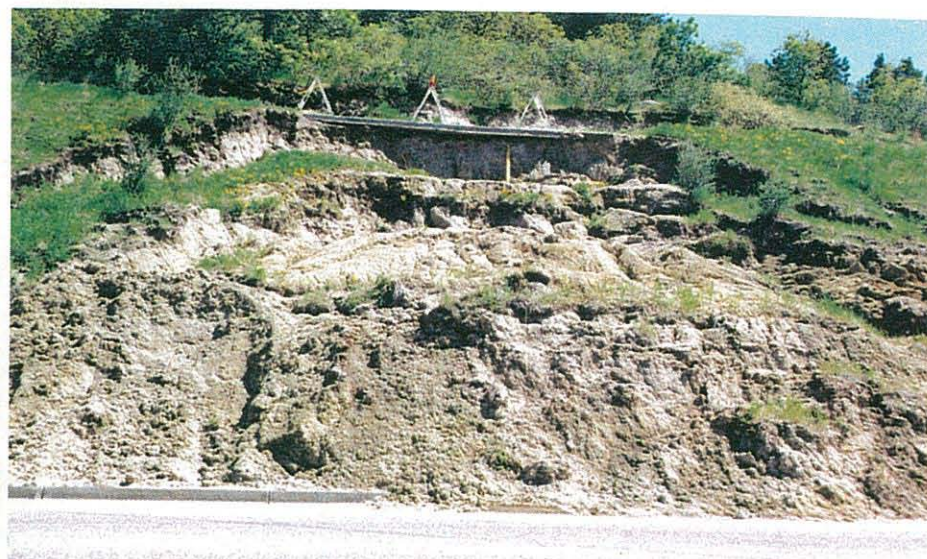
Austin Bluffs Parkway, east of Union Boulevard. Toe of landslide "flowing" over curb, scarp undermining concrete bike path (with barricades).
